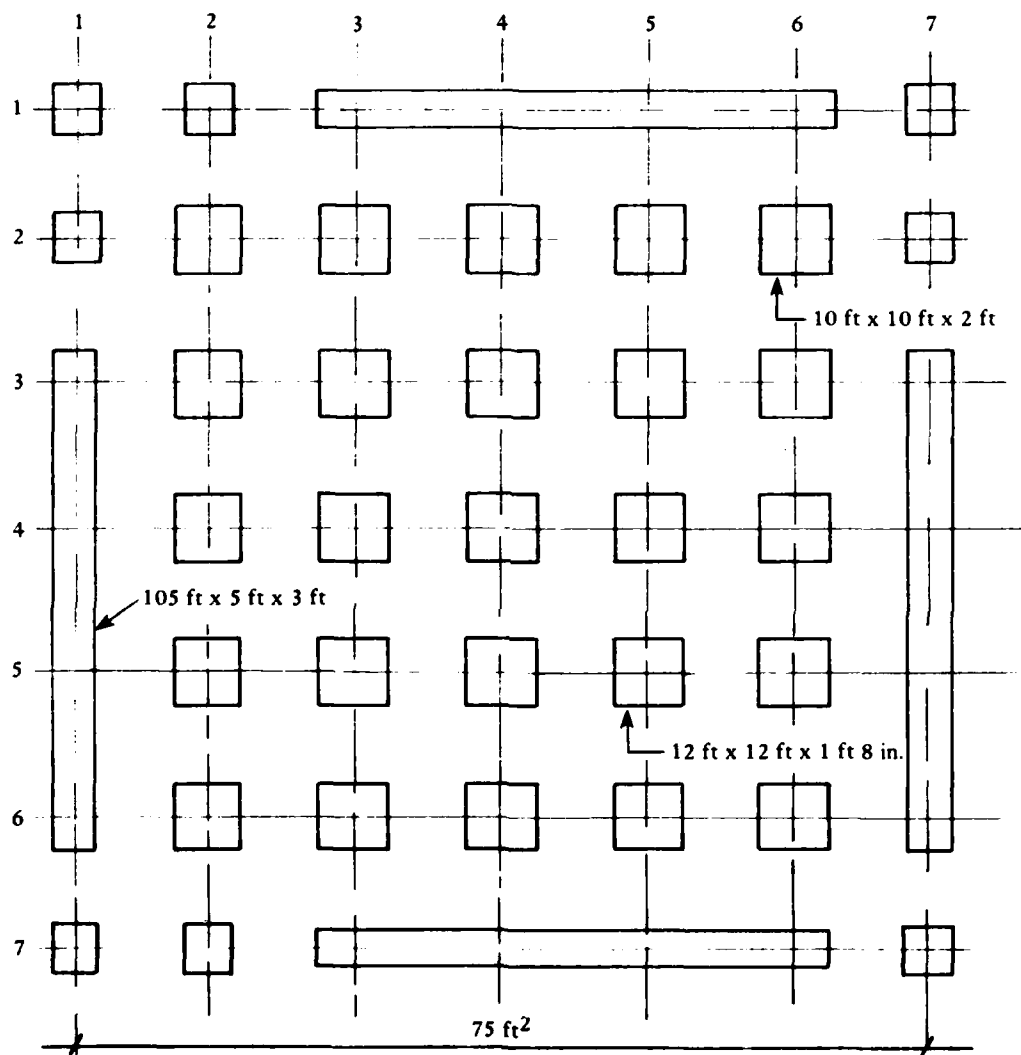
Foundation plan for shear panel 0.25–0.35g base acceleration.
